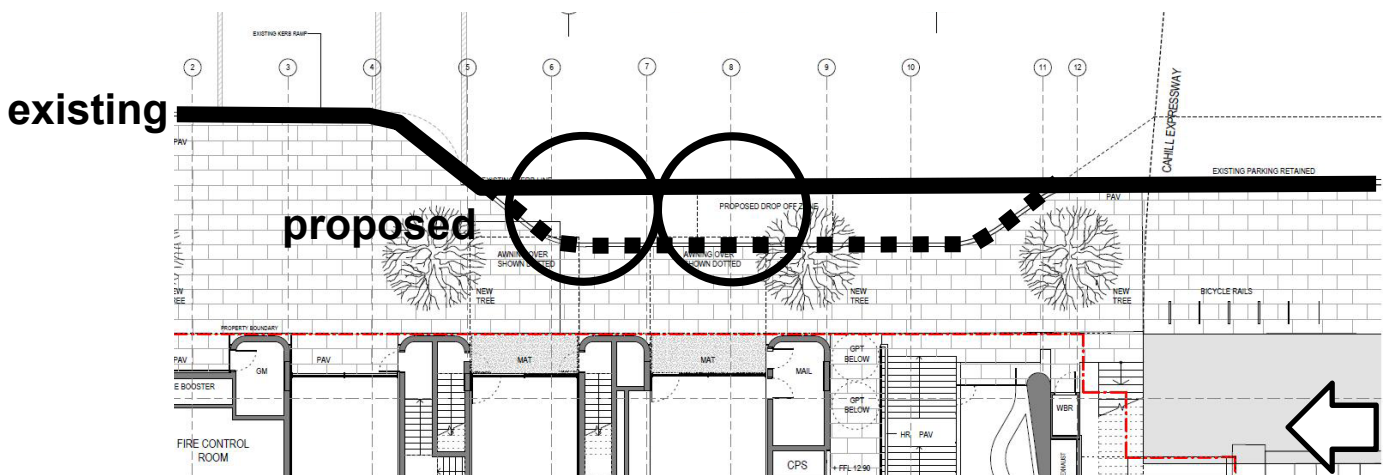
Diagram illustrating the existing (solid line) and proposed (dashed line) kerb realignment and location of existing street trees.
